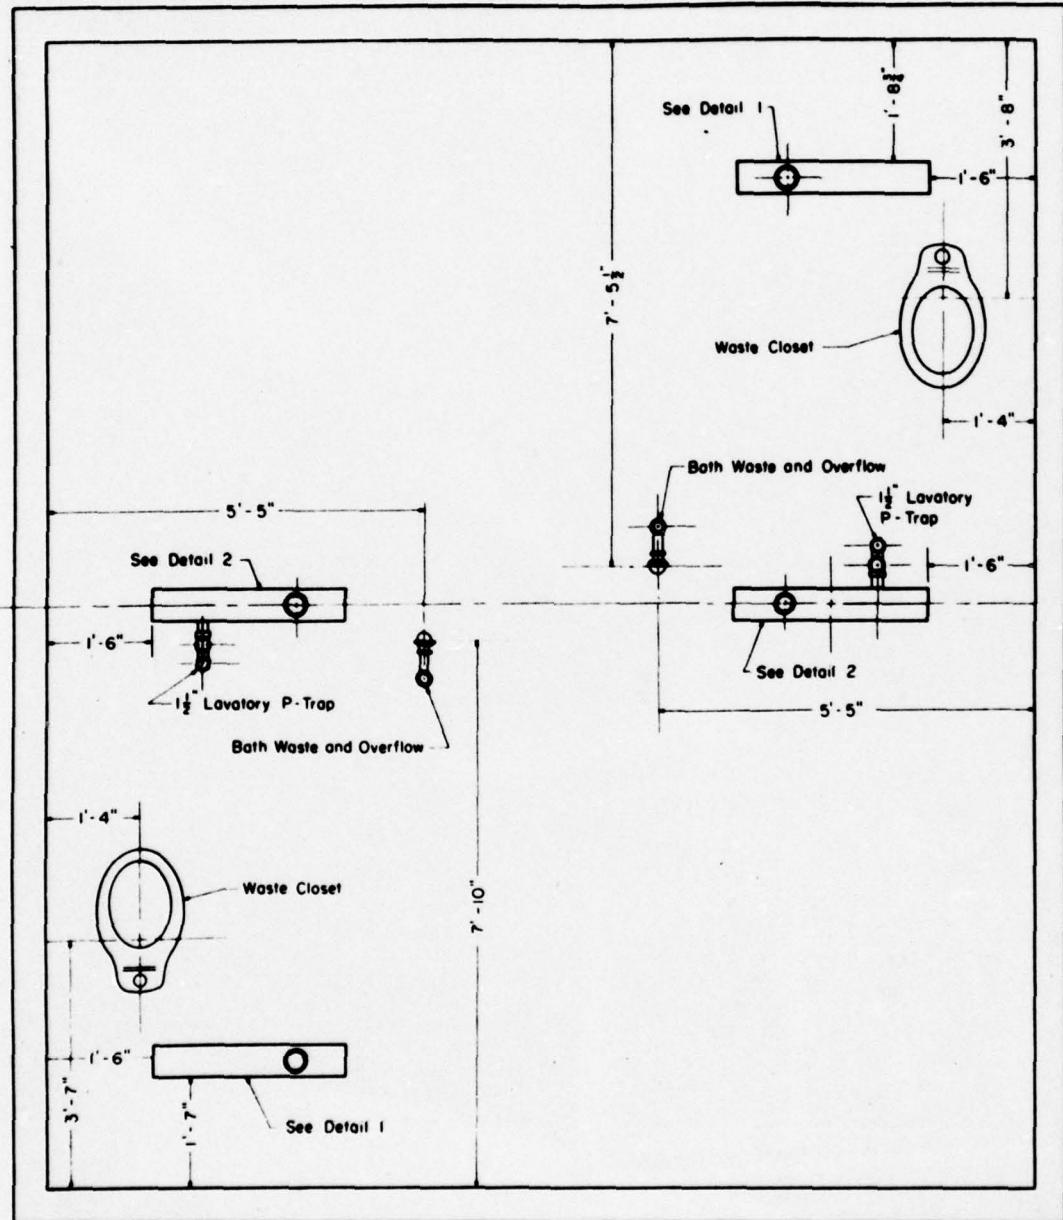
Details of the vertical plumbing and the stud walls which encased it.
